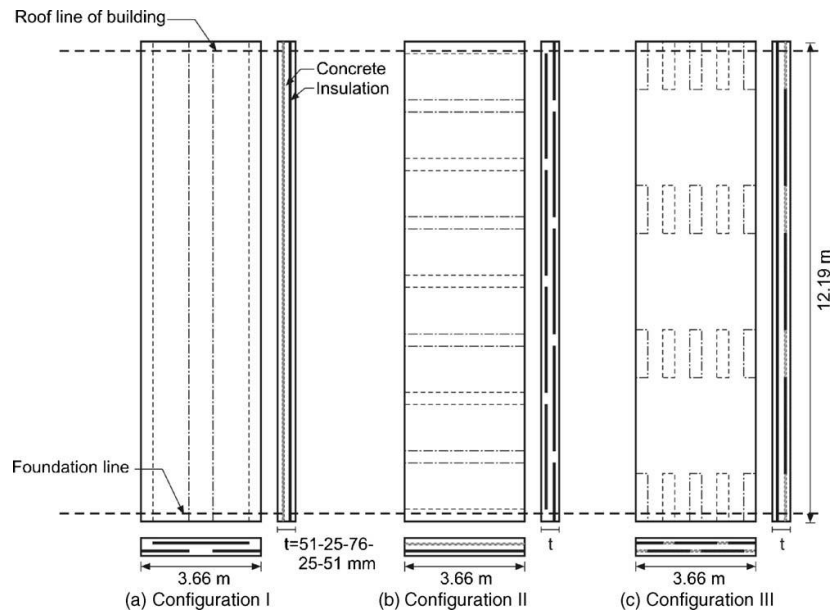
Three Wythe Sandwich Wall Panels (Lee and Pessiki 2006)
